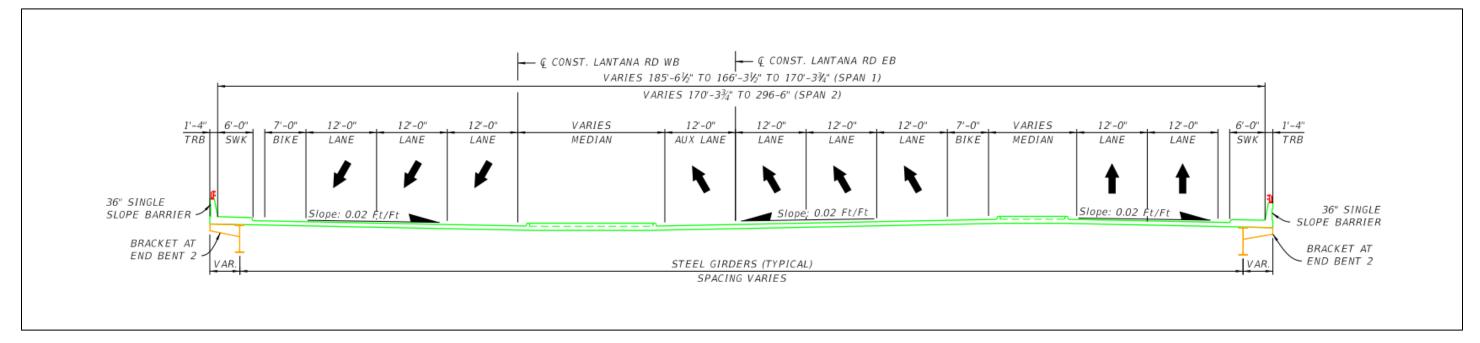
Build Alternative 2: Bridge Over SFRC Railroad - Typical Section
